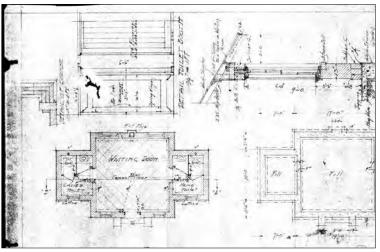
Oakwood Cemetery Annex gate house construction drawings, plan view (City of Austin)
